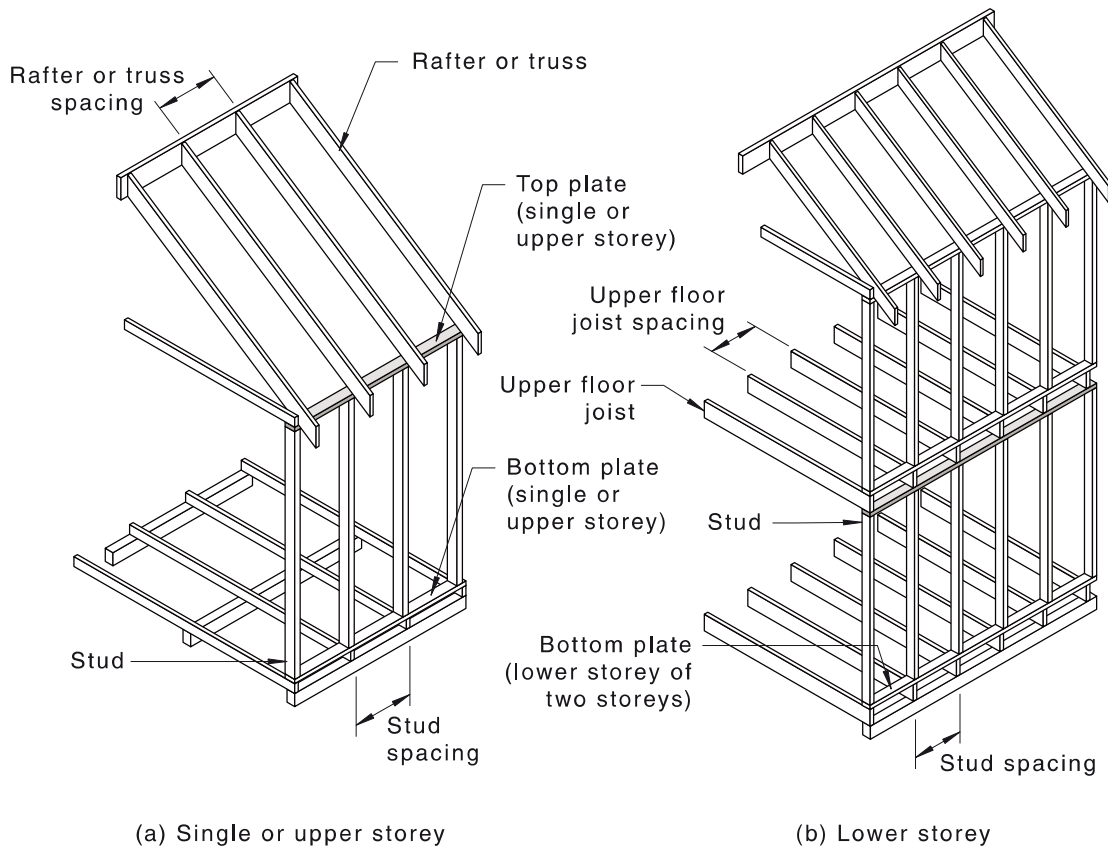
WALL PLATES FOR LOADBEARING WALLS
